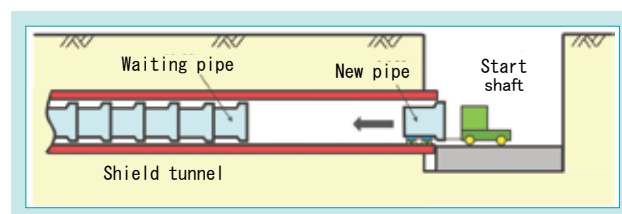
Image of Water Pipe Construction in Shield Tunnel
